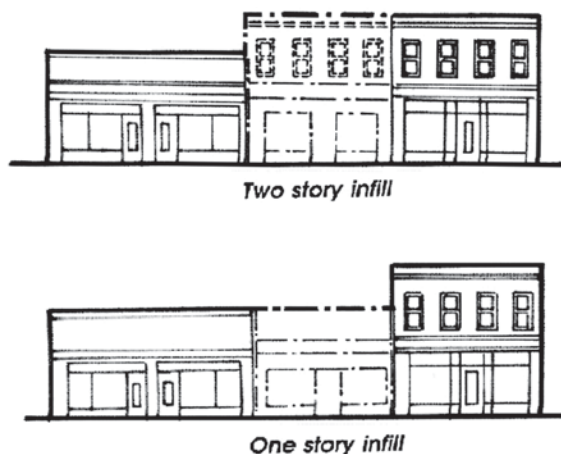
New construction should be similar to existing buildings in height, width, and rhythm of openings.
